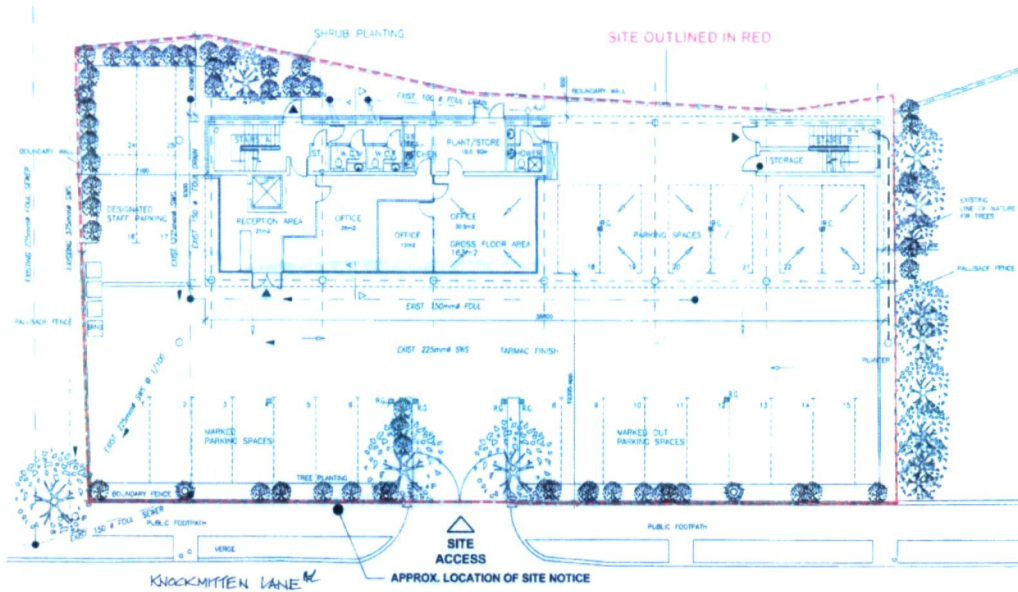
Extract of the Layout Plan of the development under Reg. Ref.: SD13A/0151
